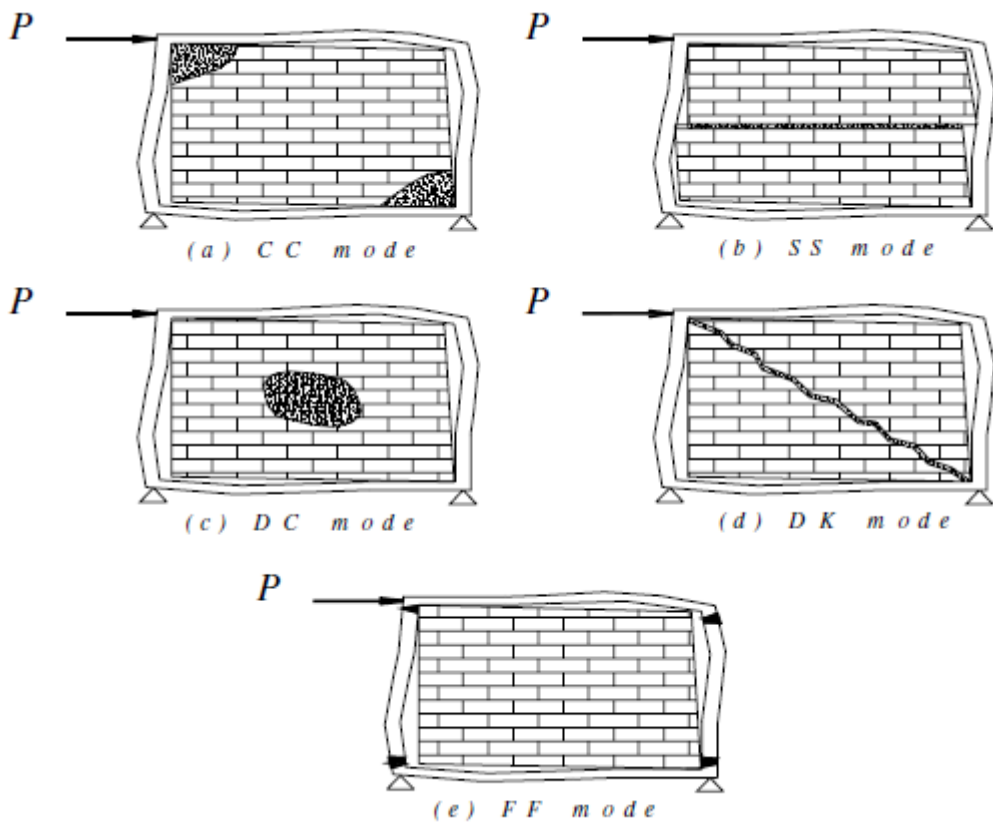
Different failure modes of in plane masonry under in plane action [3]
